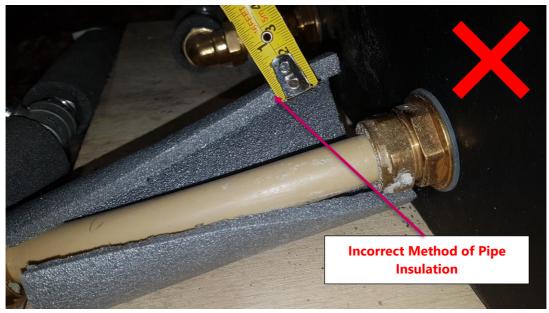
Example of Incorrect Insulation Method – the use of 9mm Pipe Insulation on Pipe connected to Water Storage Tank
